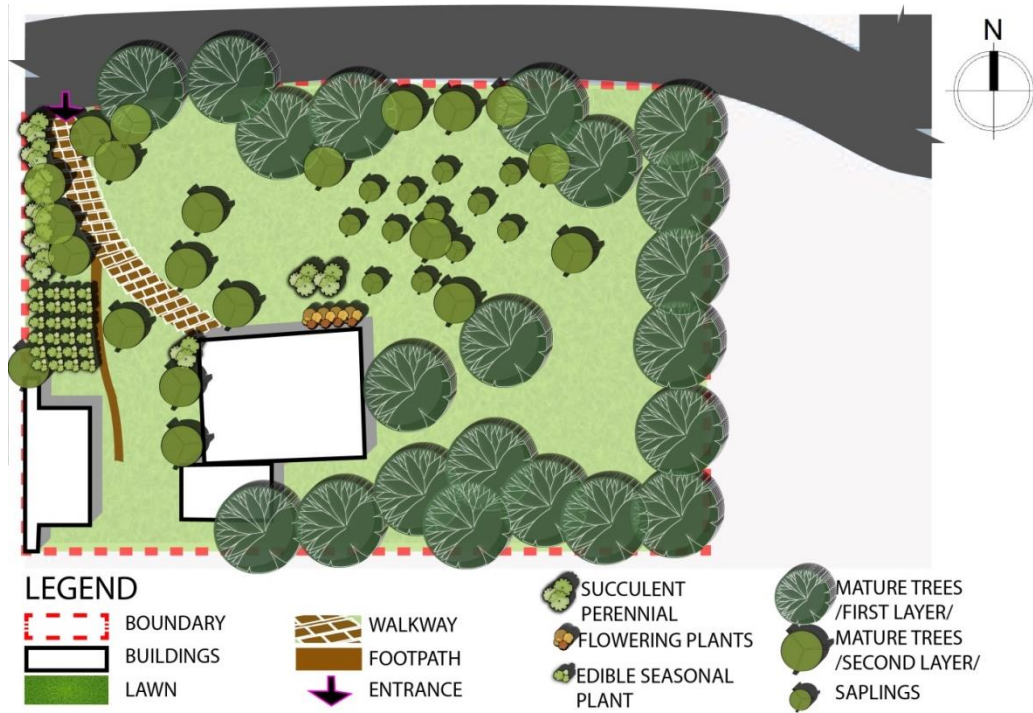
Plantation type and arrangement of *Sessa Kebele* Layout Plan of Home garden size 50-100m² (Source-Computed by the Author)
